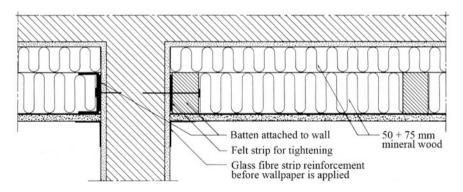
Detail of internally insulated façade around adjoining partition (perpendicular to façade)
